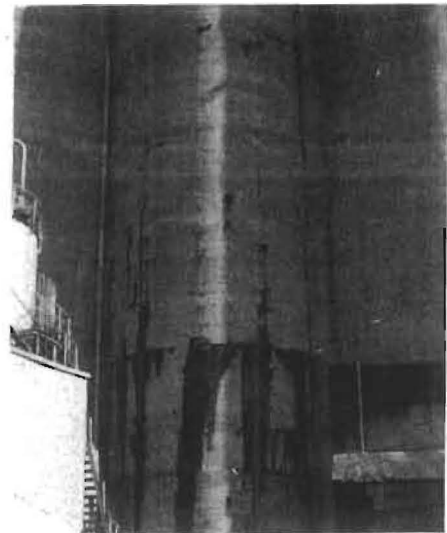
Bintight-P penetrated through a crack of a silo wall.
